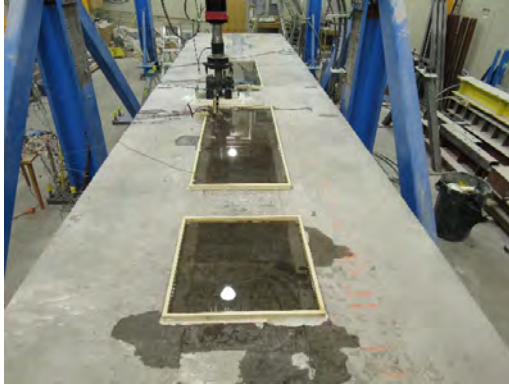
Water Dams on Rehabilitated Joint of Double-Tee Bridge Test Specimen
